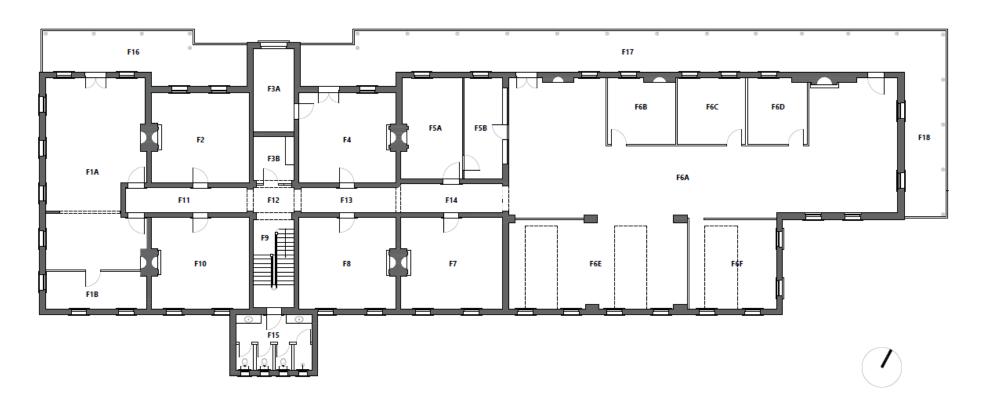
Chief Mechanical Engineers Building – Ground Floor Plan
